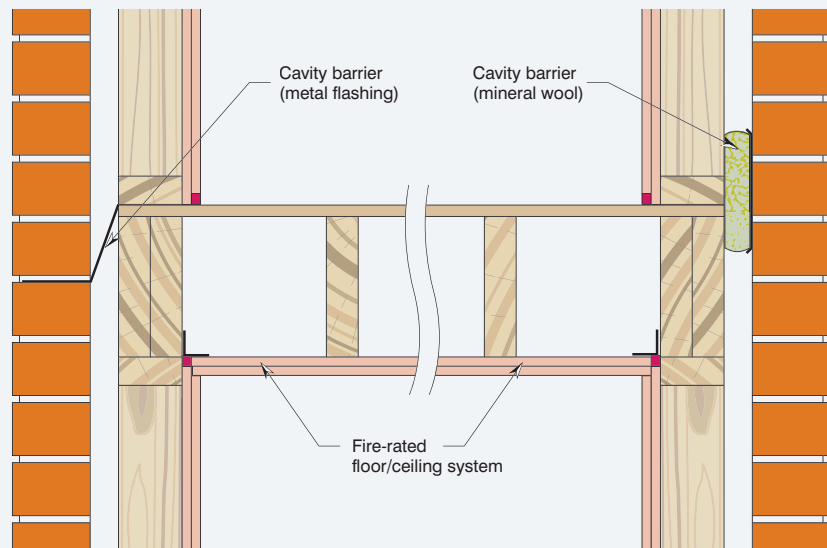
Junction between fire-rated floor and fire-rated external walls – elevation view.
